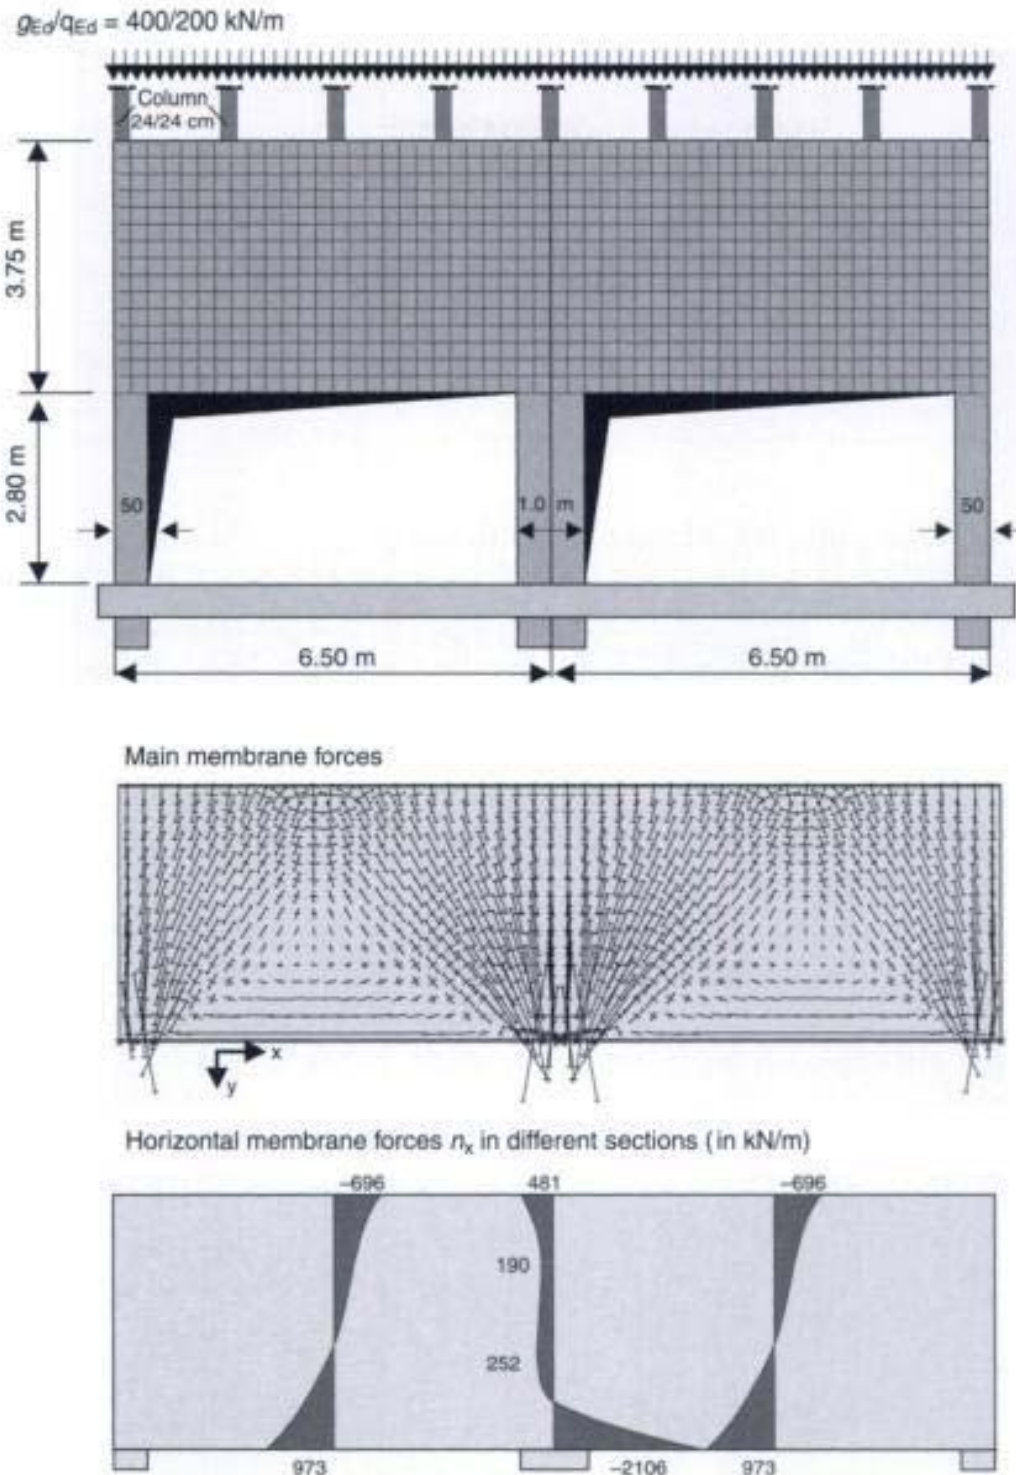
Two-span deep beam: system, loading and membrane forces
